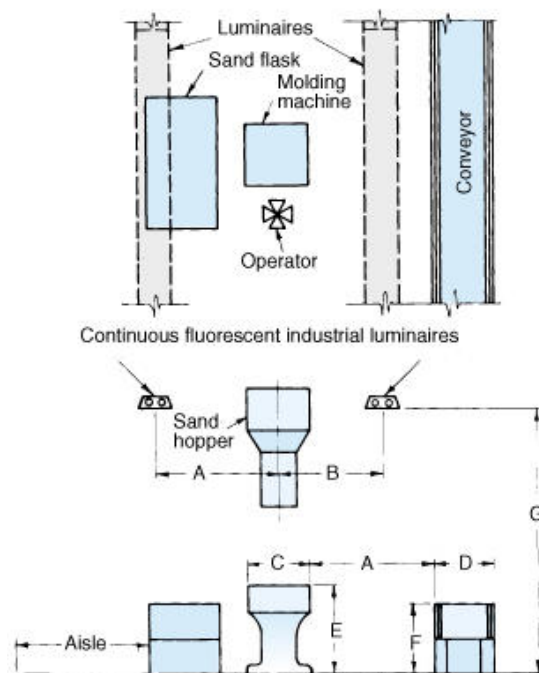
Lighting layout for molding machines used for small castings. A = 1070(42), B = 910(36), C = 560(22), D = 510(20), E = 760(30), F = 610(24) and G = 2440 millimeters (96 inches).
